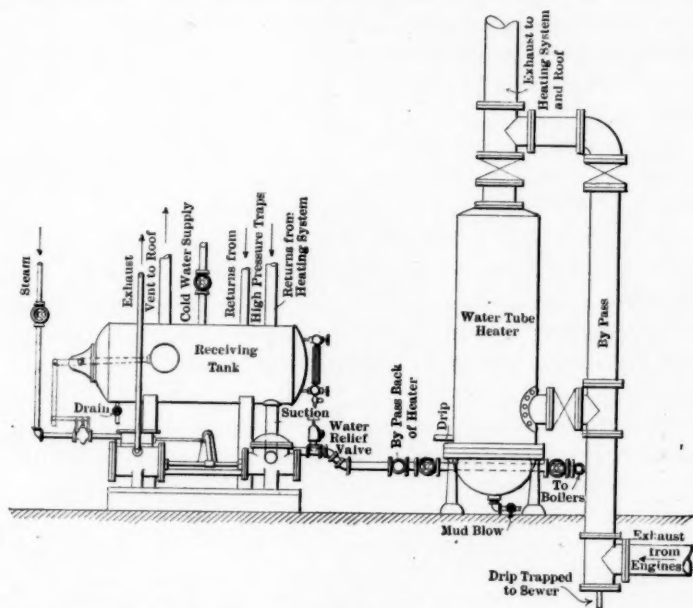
SHOWING ARRANGEMENT OF PUMP AND RECEIVER AND CLOSED FEED-WATER HEATER IN CONNECTION WITH HEATING SYSTEM.
